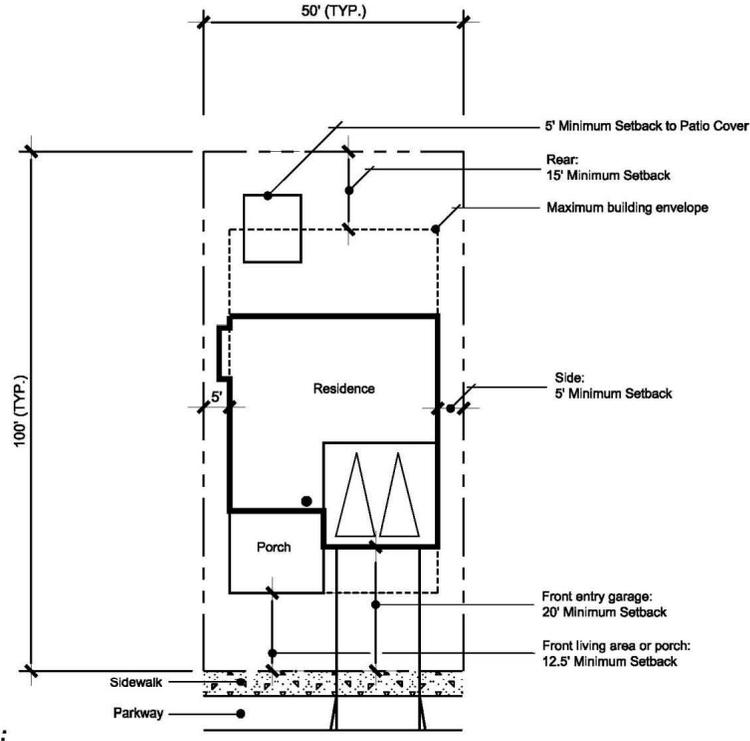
Village 3A or 3B Example of Typical Setbacks
